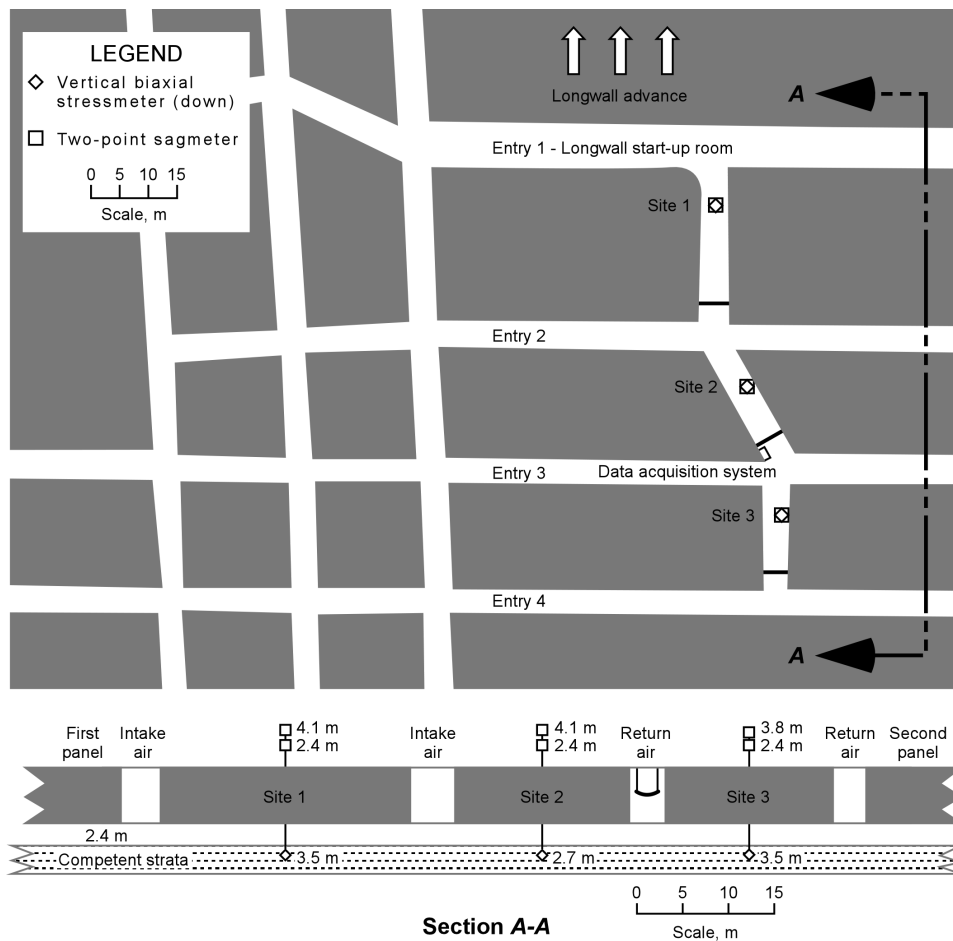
Plan view and vertical section of monitoring system with instrument layout and datalogger, mine B.
